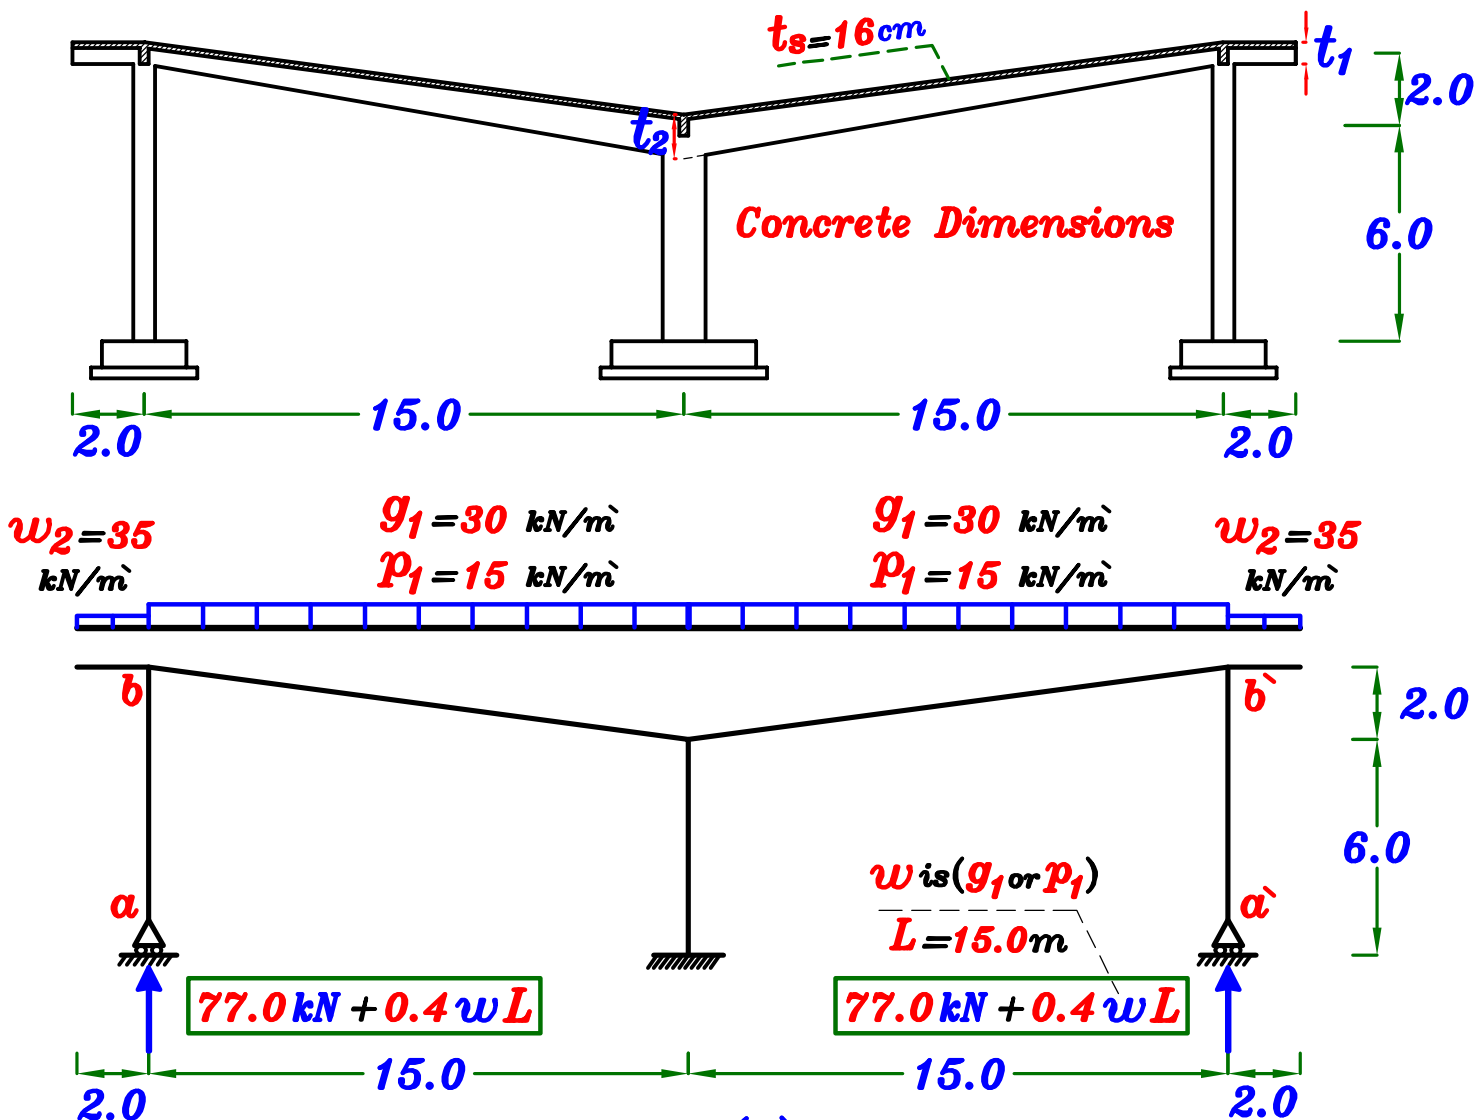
shows concrete dimensions and statical system of a Frame in an industrial building. The interior spans of the Frame are subjected to dead and live loads equal to 30, 15 kN/m respectively while the external cantilevers are subjected to total load equal to 35 kN/m
